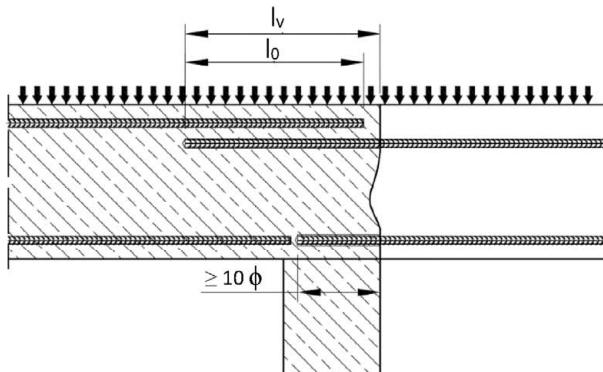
Overlapping joint at a foundation of a wall or column where the rebars are stressed in tension
